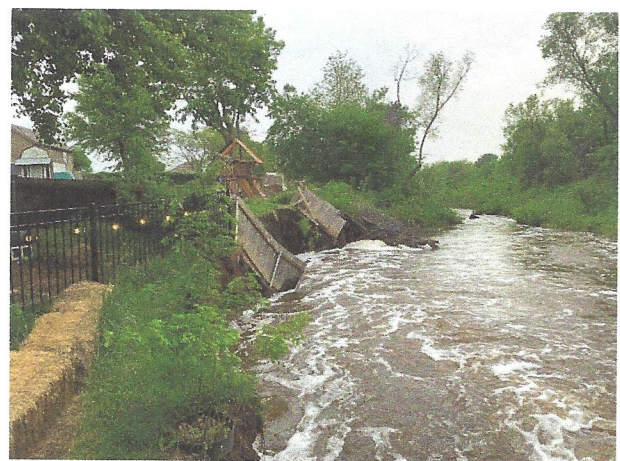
taken 04/28/25 shows several sections of the back fence at 424 Laws has fallen into the creek
